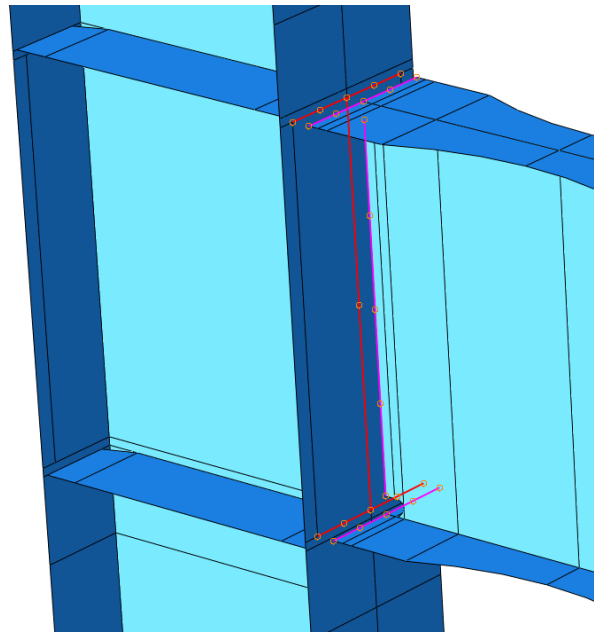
Beam-to-Column Joint Modelling with Tie Constraints
